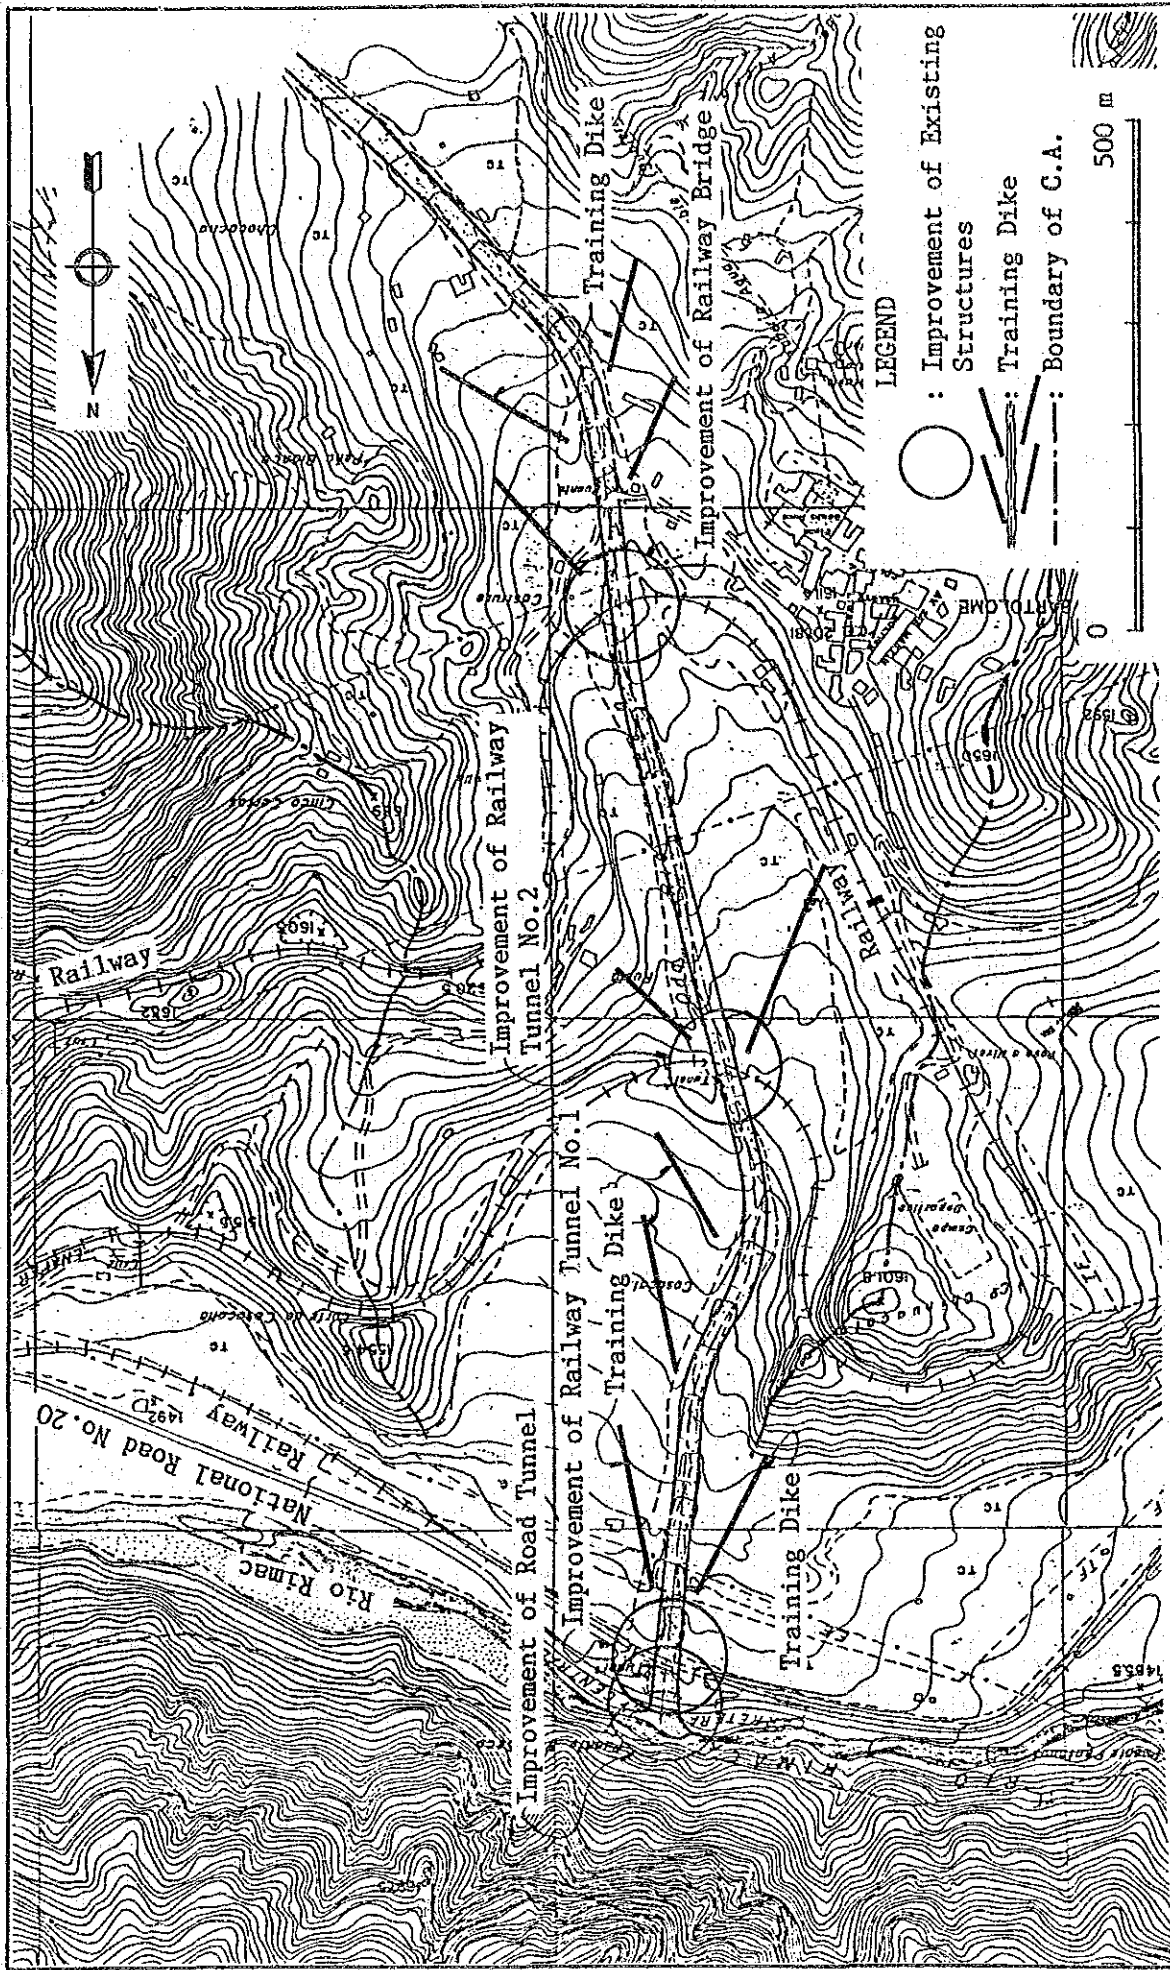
Alignment of Channel and General Layout of Structures in Qda Rio Seco
